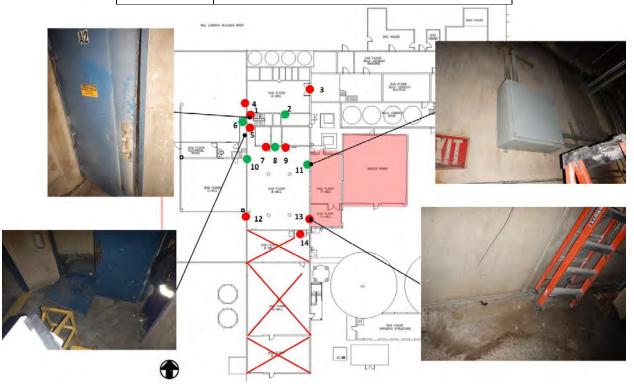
Mill A and Mill B Level 2 Exemplar Blast Indicators
